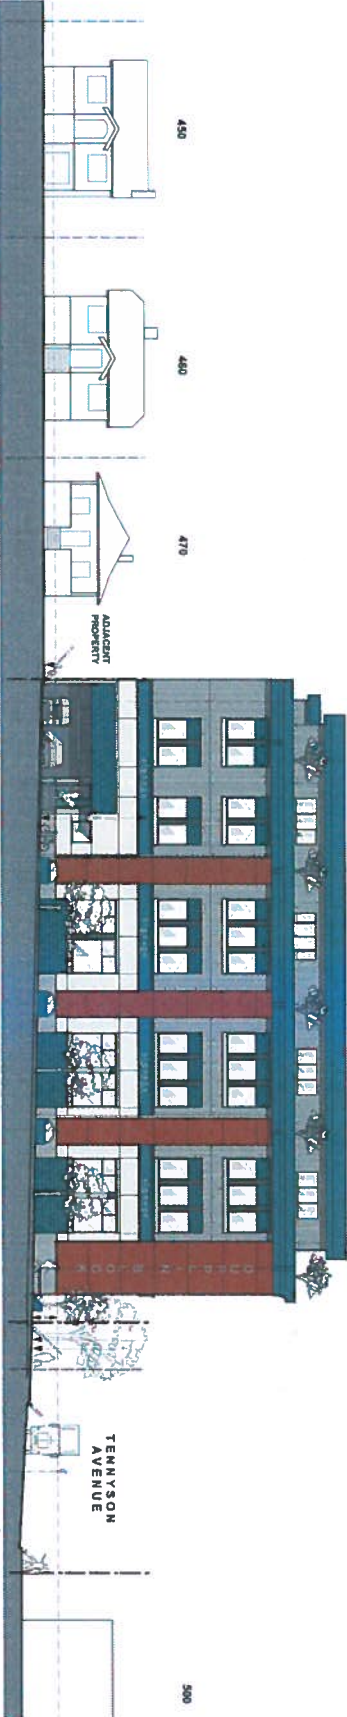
South (Dupplin Road) Streetscape Elevation (from plans by Boni Maddison Architects)
